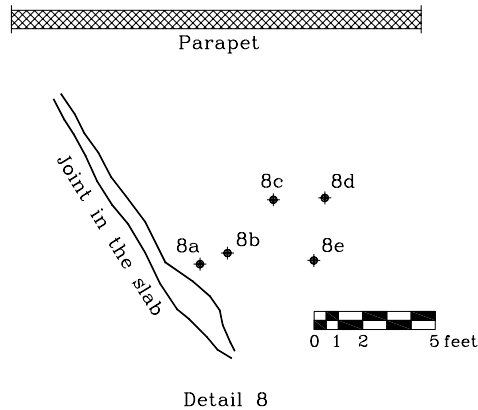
Map of cracks at coring locations for Bridge Deck Number 8 (Structure No. B01-82194)
